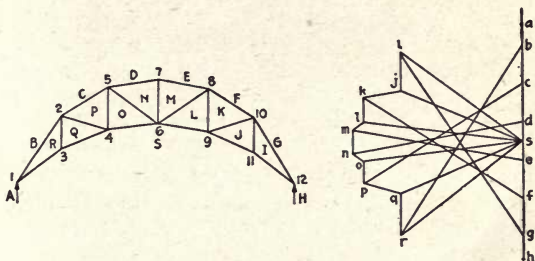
Crescent Roof Truss. Whipple Framing.
